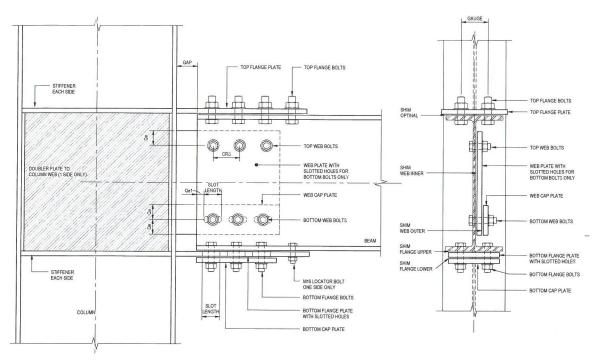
Sliding Hinge Joint – Elevation and Section and plans – Top Flange Section.
